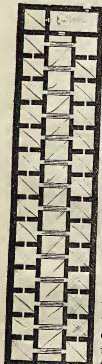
Egyptian Egg Oven, Ground Plan.
